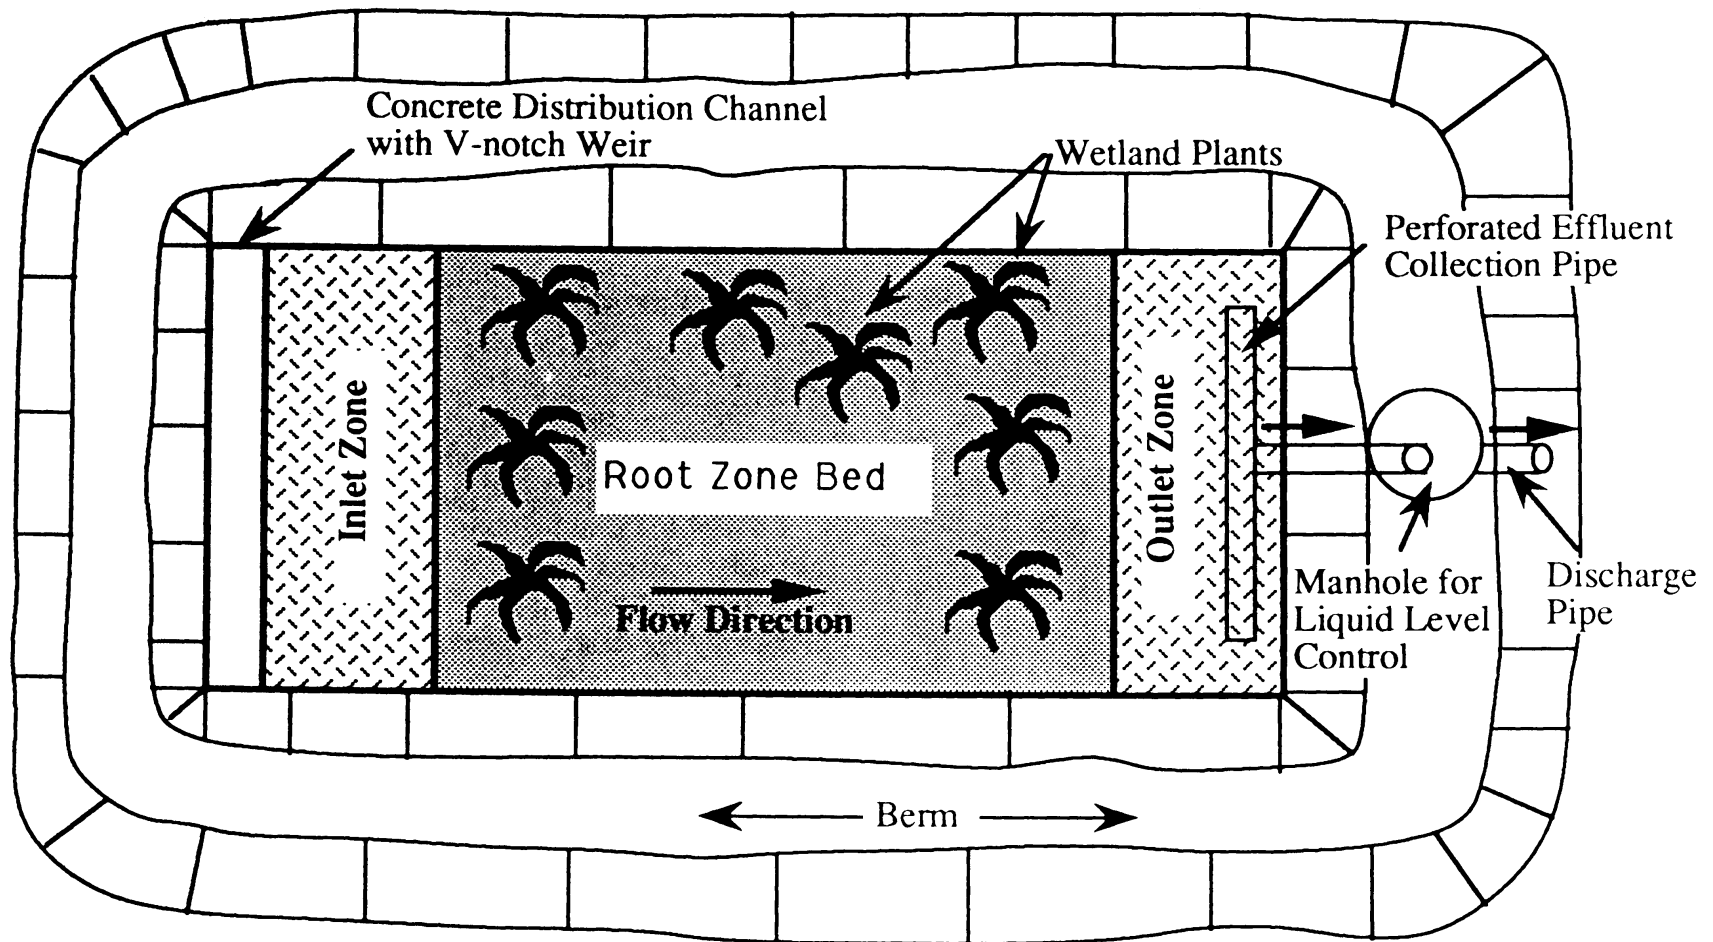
Plan view of typical horizontal flow reed bed system. Taken from Conley et al., 1991
